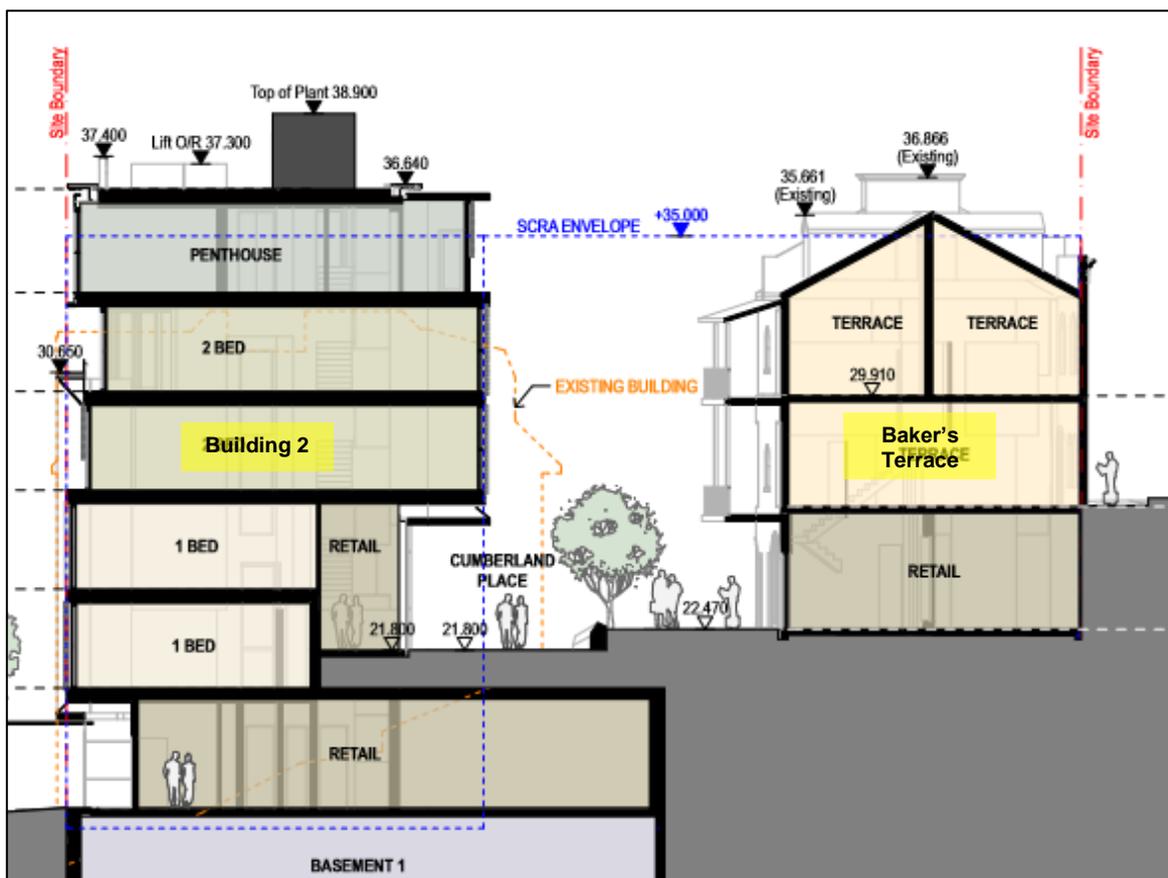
Cross-section of Building 2 and Baker's Terrace (Source: Architectural Plans)
